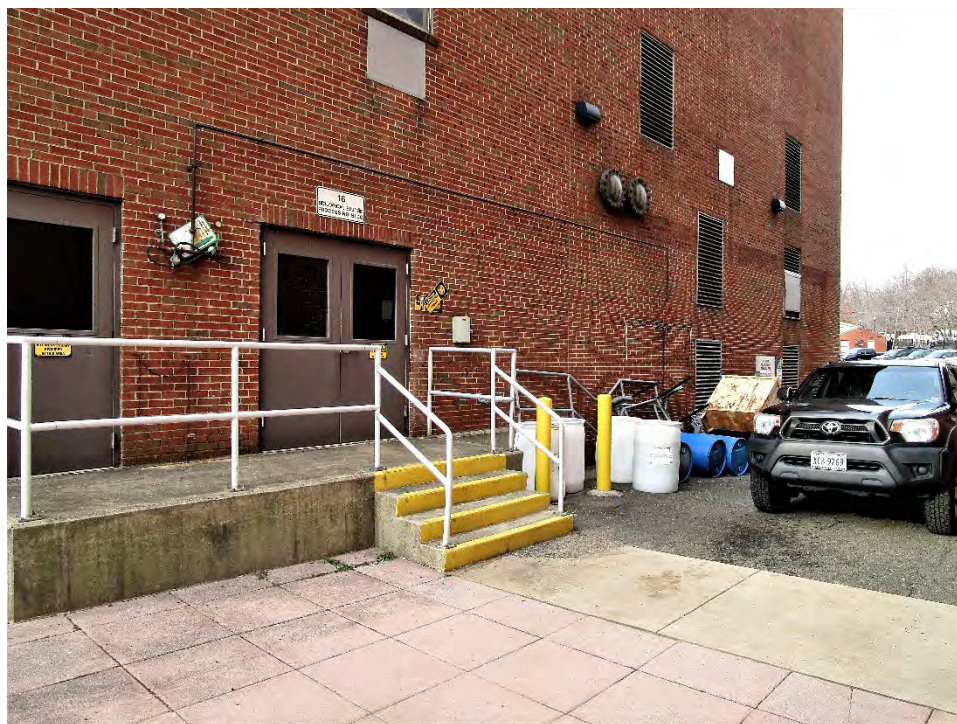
Bio-Building to Demolish (Photo 2 of 2)
